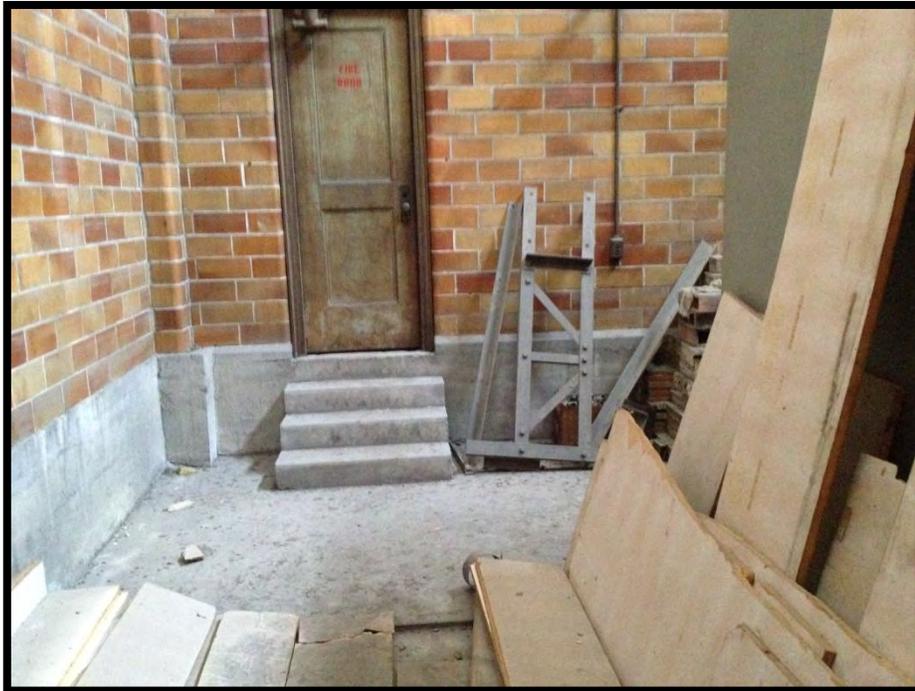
Interior portion of 2229 Spring Grove Avenue, first floor.
